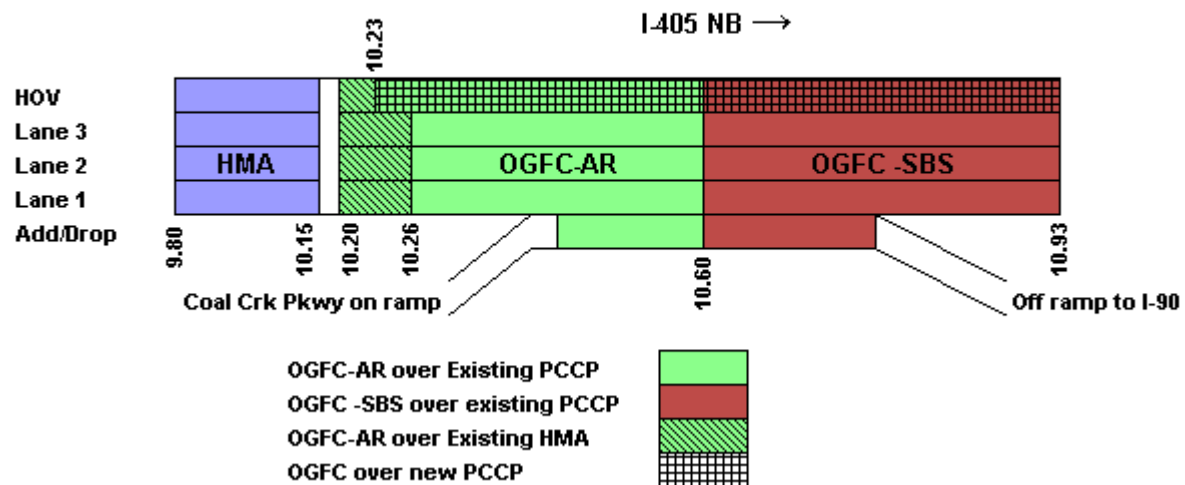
Schematic of paving limits for test sections south of I-90 (south section).
